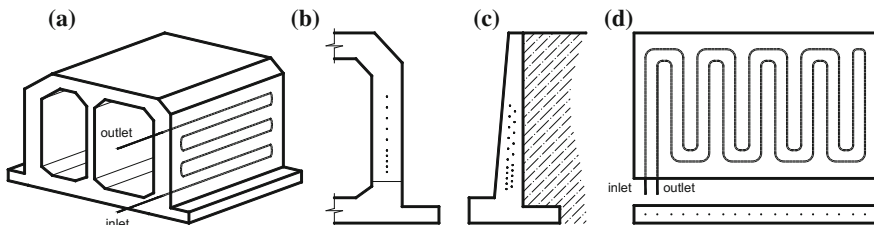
Examples of embedded concrete pipe systems layouts for a tunnel segment, b gallery wall (linear set-up), c retaining wall (staggered set-up) and d slab. (Sfikas et al. 2016)
